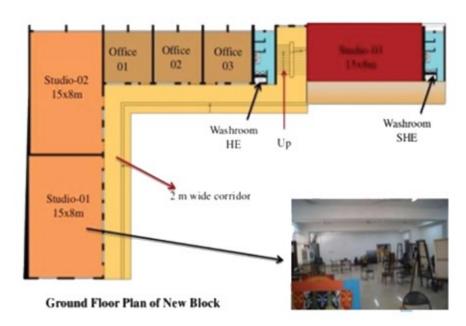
GROUND FLOOR PLAN OF NEW BLOCK
